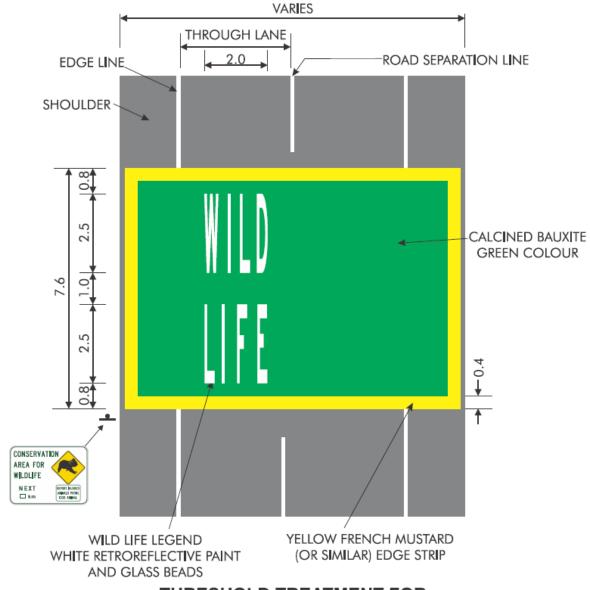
Pavement treatment at Clothiers Creek Road (Source: Tweed Shire Council)
